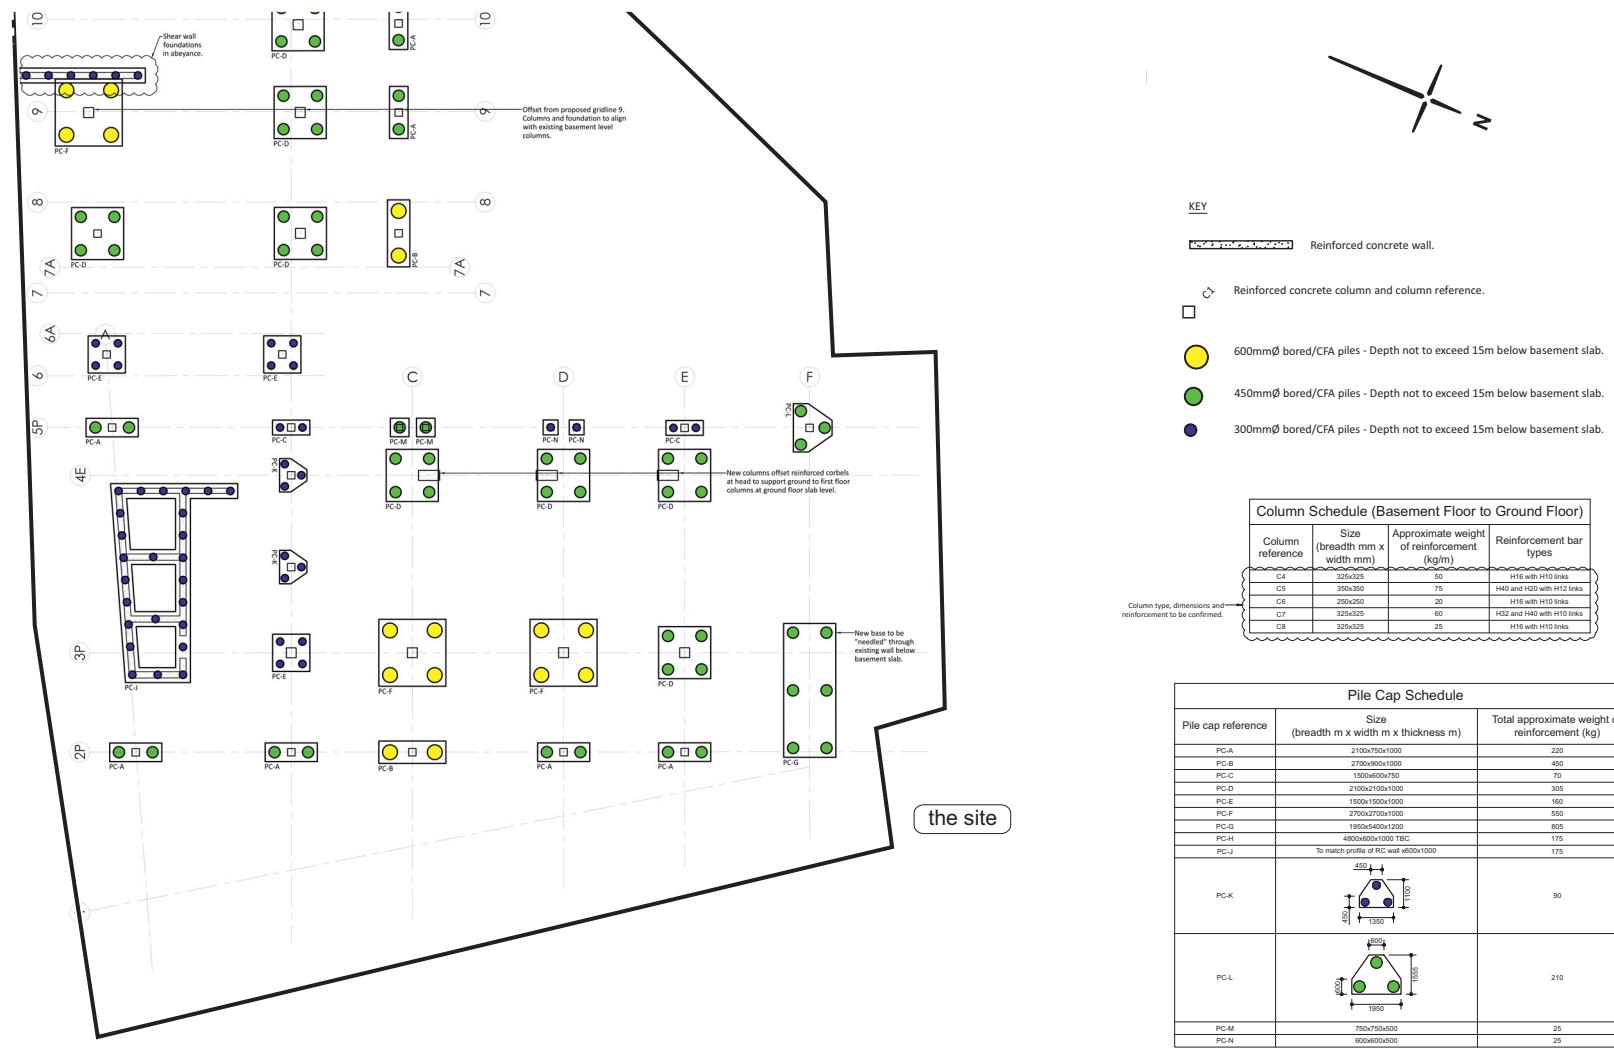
Basement floor foundation plan showing location of new column foundations pads (jpp, Drawing No. SK001, Rev. P1, 21/08/2018)
